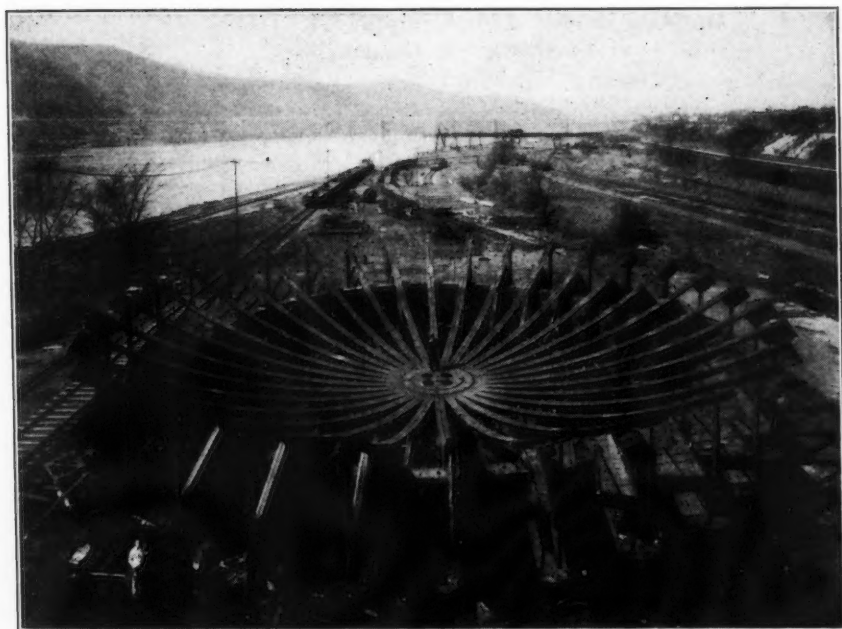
TEST ASSEMBLY OF RING GIRDER AND BOTTOM DRUM AT THE FABRICATING PLANT
